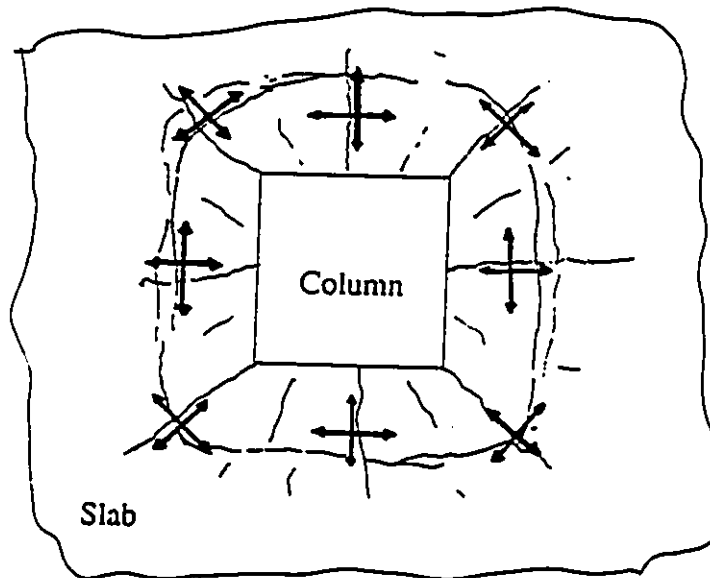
Plan view of the distribution of the forces in a square column connection
